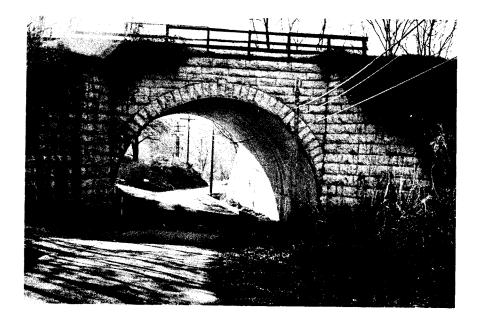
The stone arch railroad underpass was constructed in Page County by the Shenandoah Valley Railroad Company between 1870 and 1881. The Shenandoah Valley Railroad was purchased by the N & W Railroad Company in 1890.
